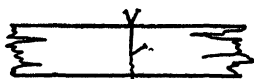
Batter strip with two nails driven V-shaped in place of notching the wood. One way is as good as the other
